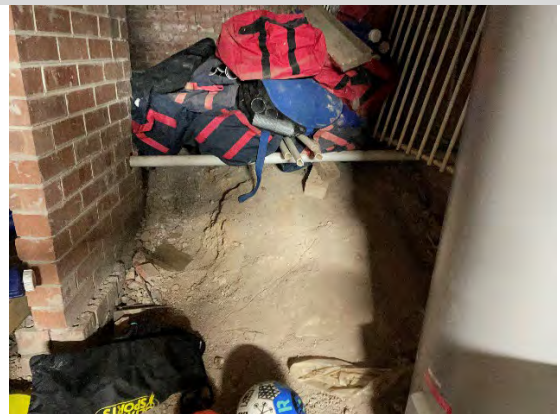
Exposed natural rock outcrop beneath existing building basement.
